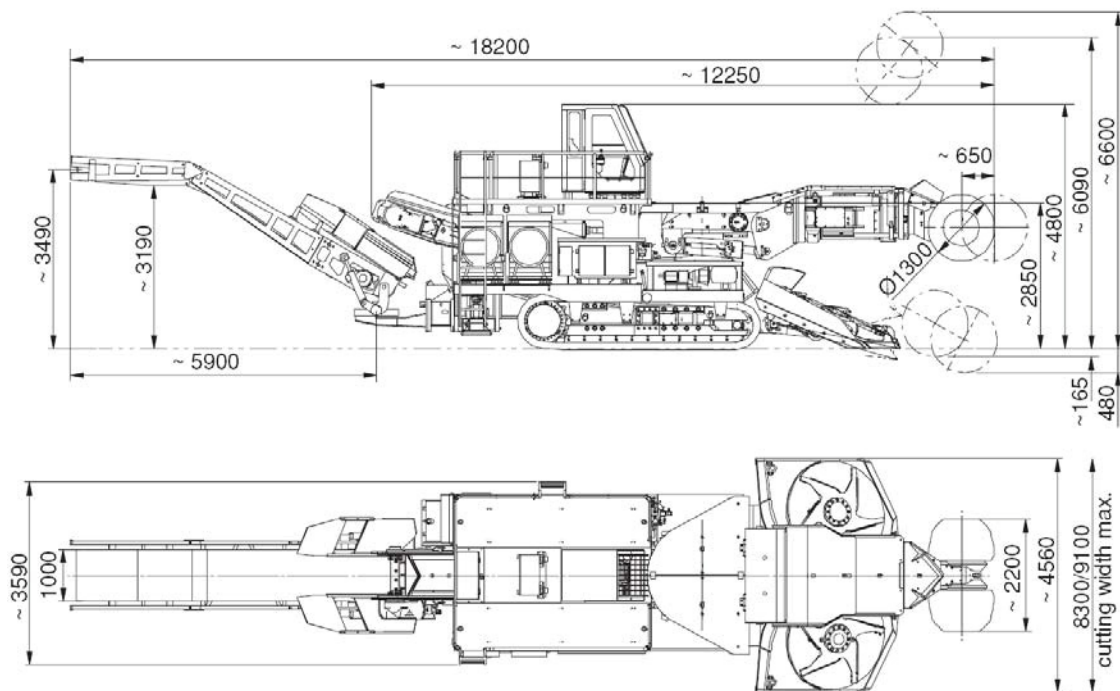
Plan view and cross section of the roadheader ATM 105 ICUTROC
